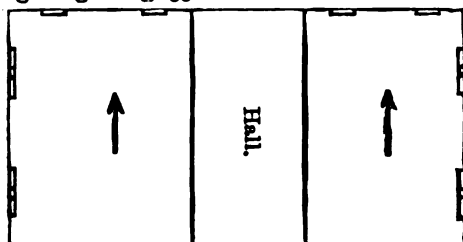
Schenectady, Park Place. Facing light needlessly.
